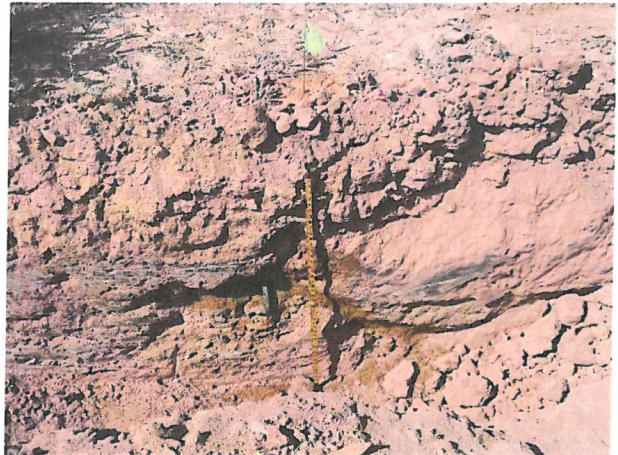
A1-12 – T-4 location: Looking northeast along the upstream side of the dam showing longitudinal crack in northeast wall.
